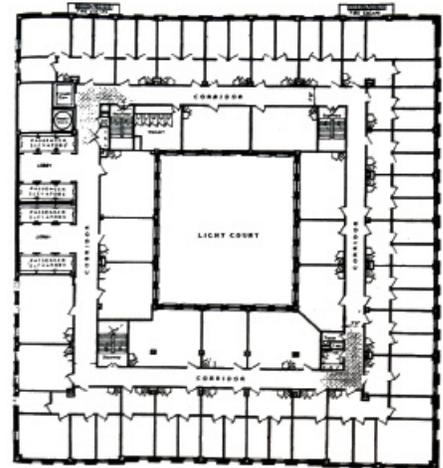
Straus Building, Chicago. Typical distribution of a "quarter block" building.
